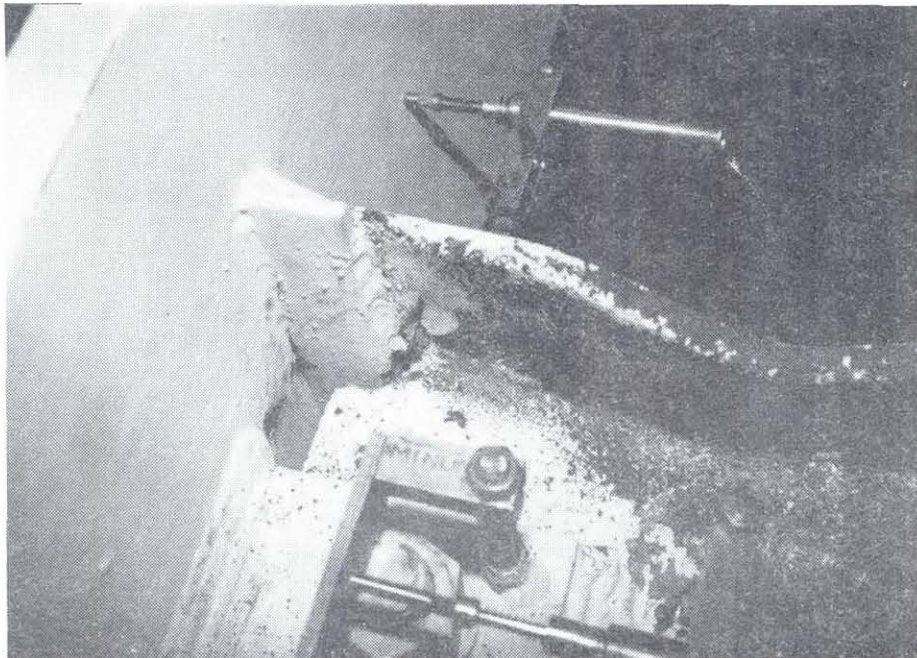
Beam Top Flange Cracked at the Center (Specimen 14)
